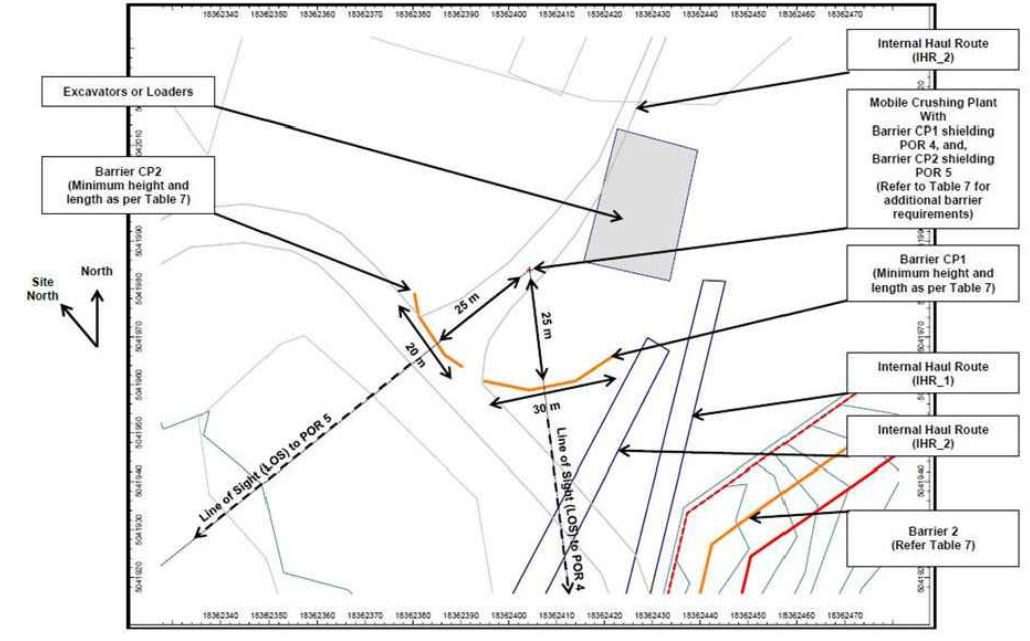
Detail plan at Mobile Crushing Plant showing Barrier CP1 and CP2
